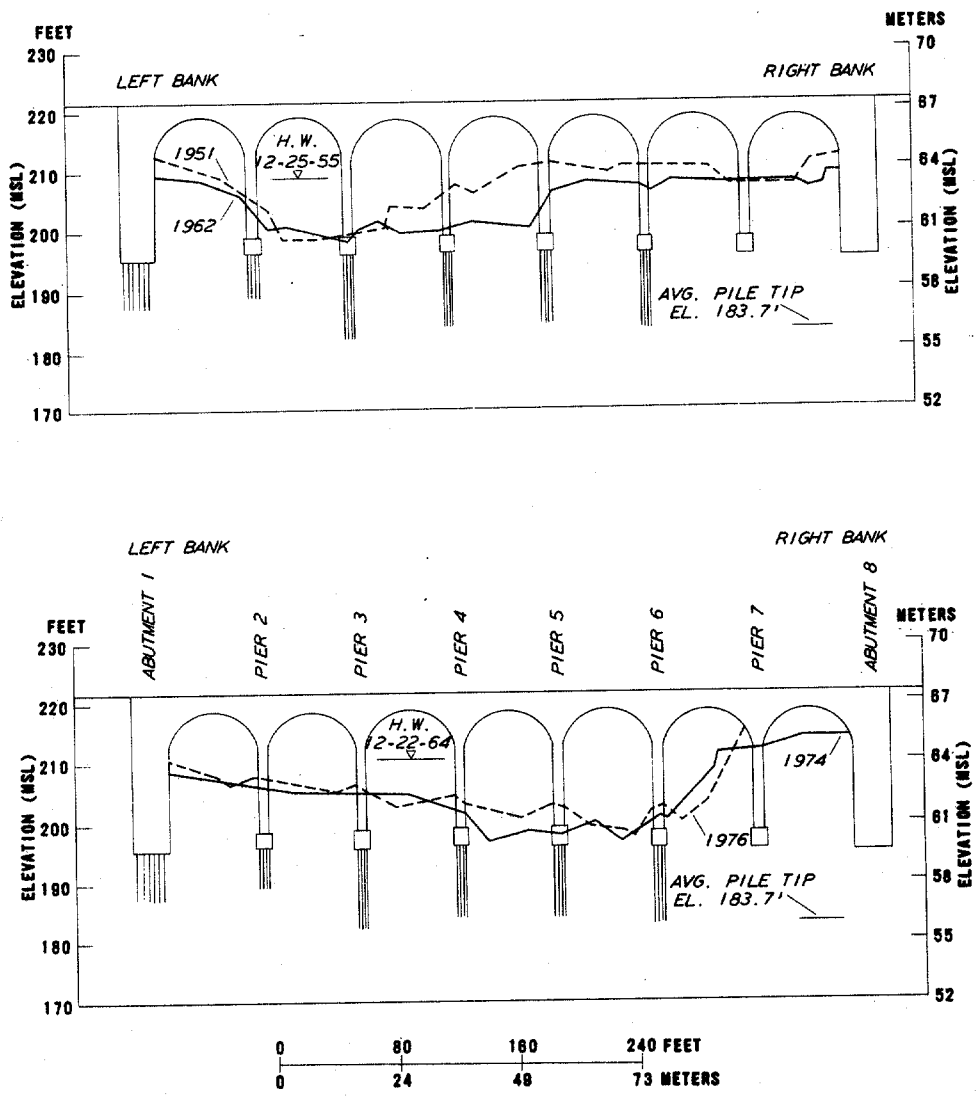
Cross sections of Deer Creek showing bridge built in 1921 and channel changes between 1951 and 1976.
